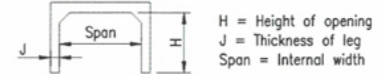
(g) Reinforced Concrete Box Culvert (RCBC) - Sheet 2
